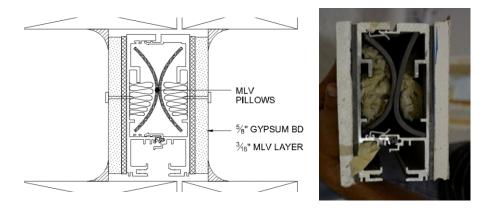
MULLION CONSTANT 2 (MC2) SHOWN IN PLAN (LEFT) AND SPECIMEN PHOTO (RIGHT)
